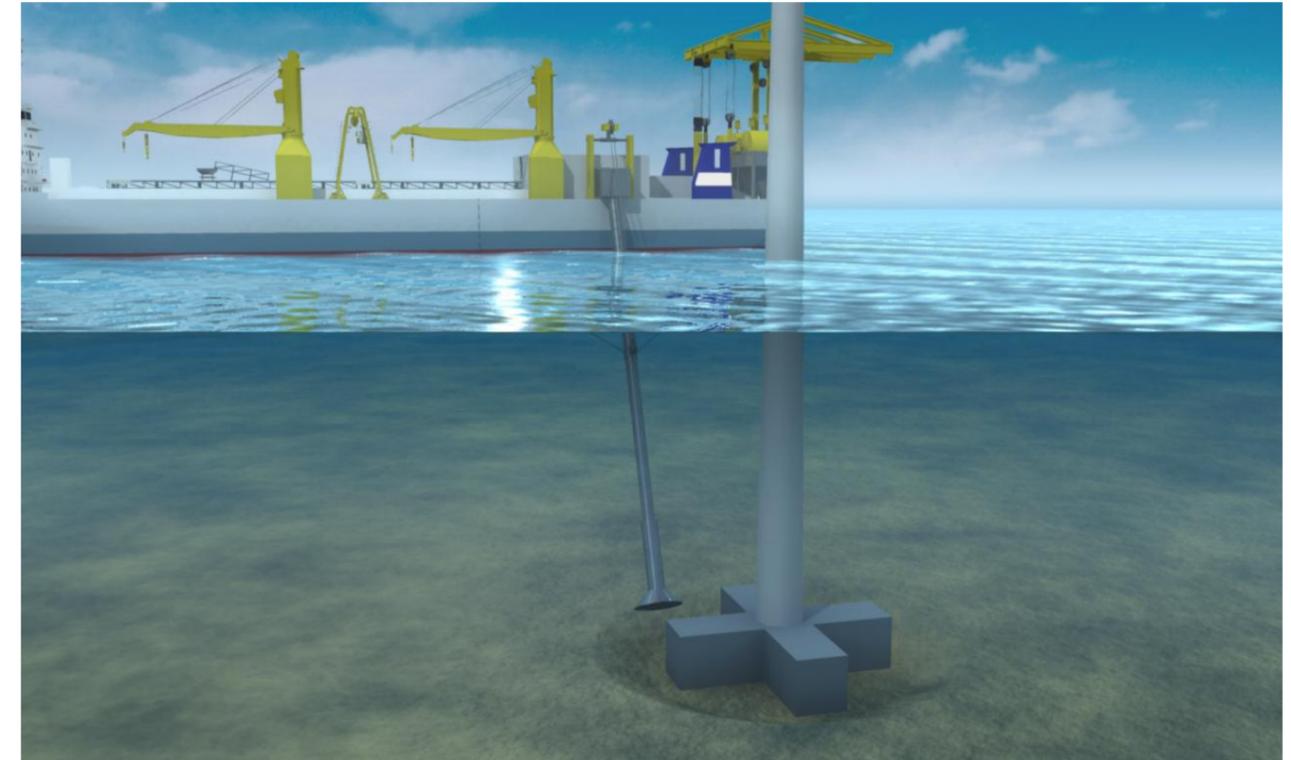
Installation of scour protection around cruciform shaped gravity base foundation (Source: Strabag Offshore Wind GmbH)
